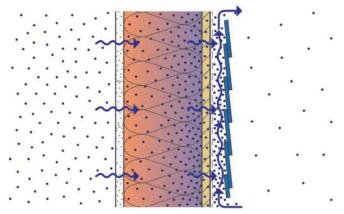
Vertical Section through Insulated 2x6 Wall with Ventilated Impermeable Cladding
